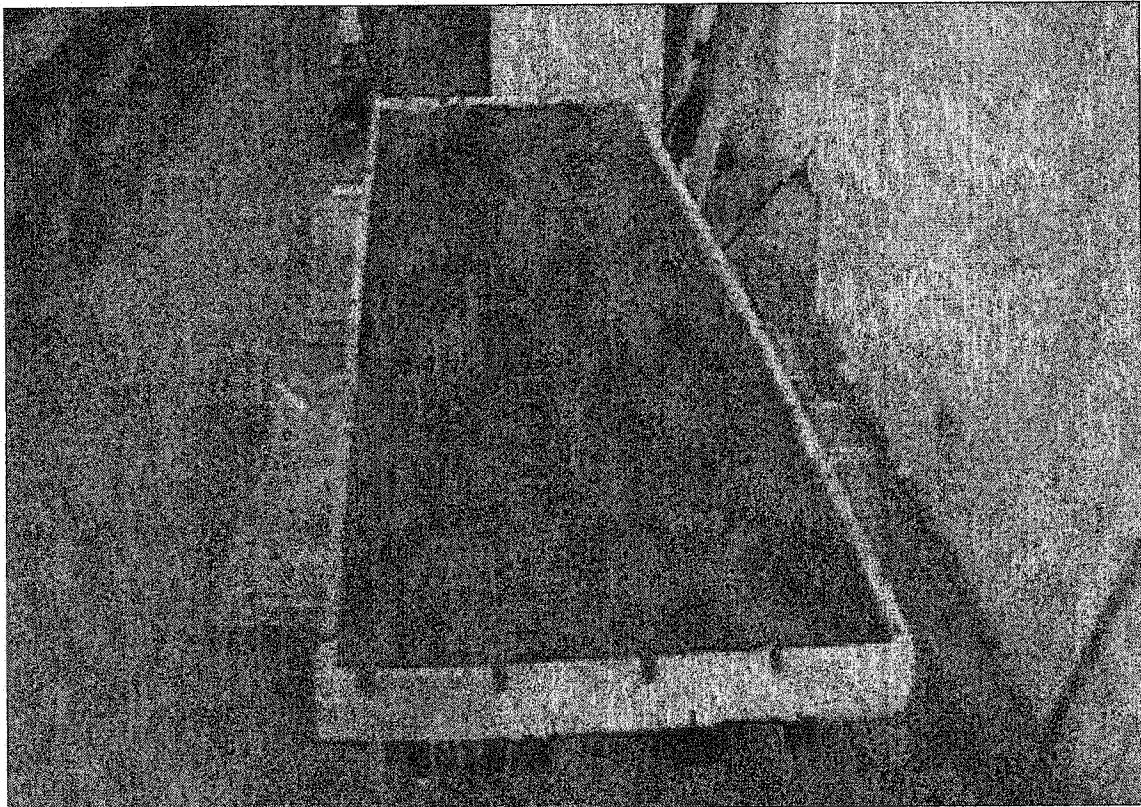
View of Bridge Model M3 after pouring and finishing the concrete slab
